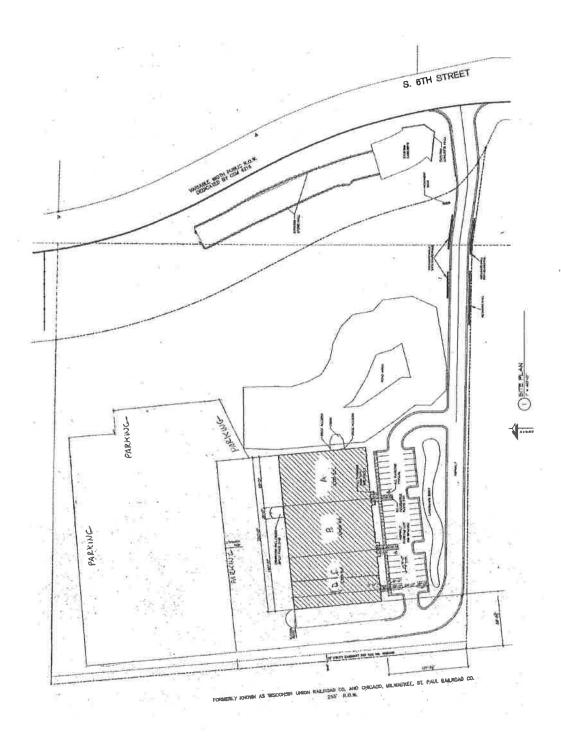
EXHIBIT B: EXISTING SITE PLAN FOR TRUCK PARKING
